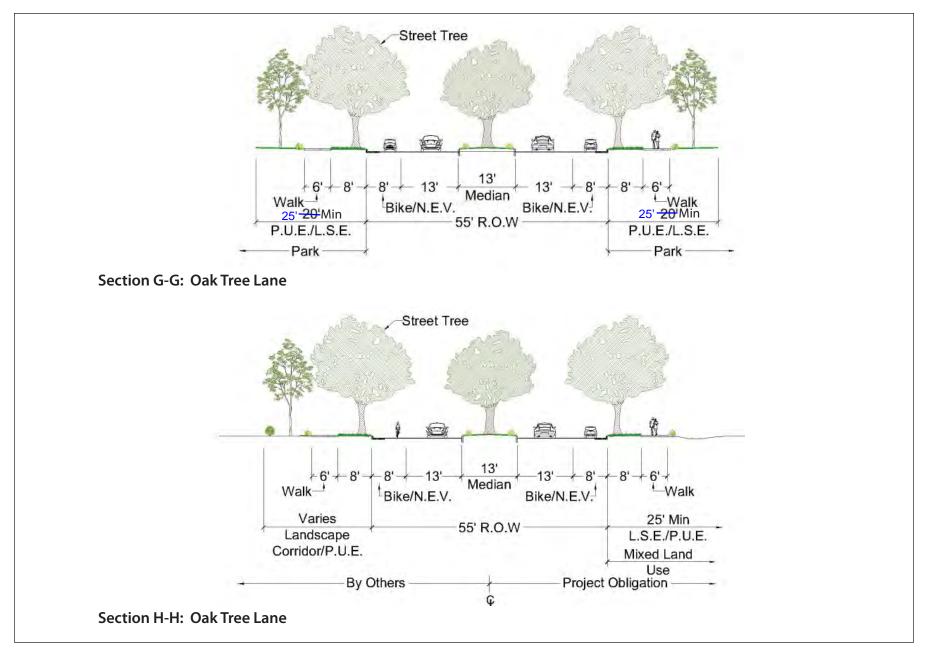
Minor Arterial Street Cross Sections - Oak Tree Lane
